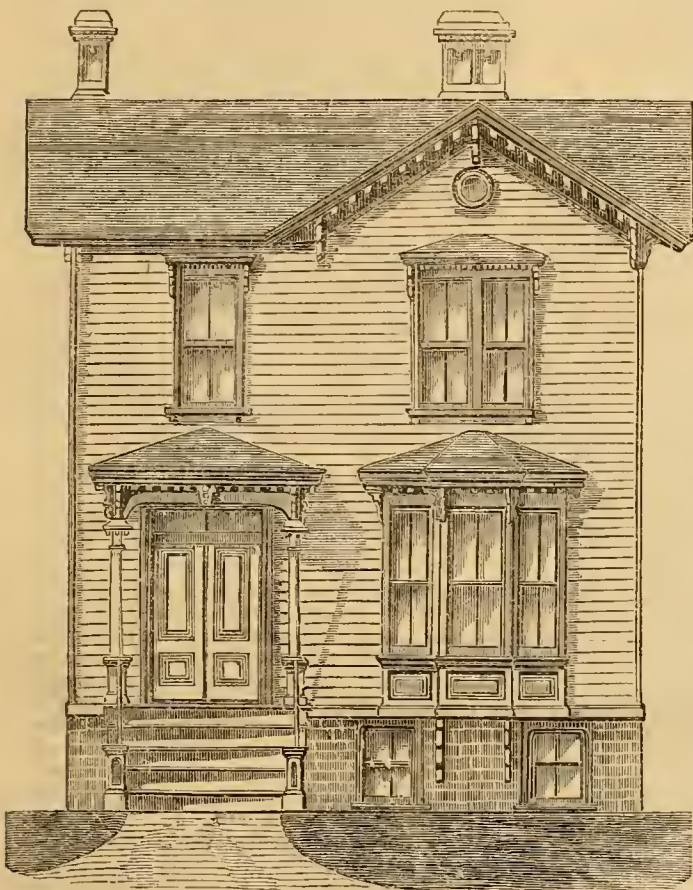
ELEVATION OF FRONT OF HOUSE.
